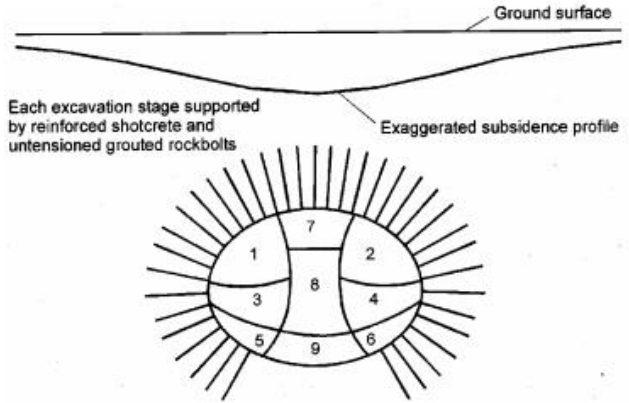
Excavation and support stages for an underground station of the Athens Metro. Temporary support consists of double wire mesh reinforced 250 - 300 mm thick shotcrete shells with embedded lattice girders or steel sets.
